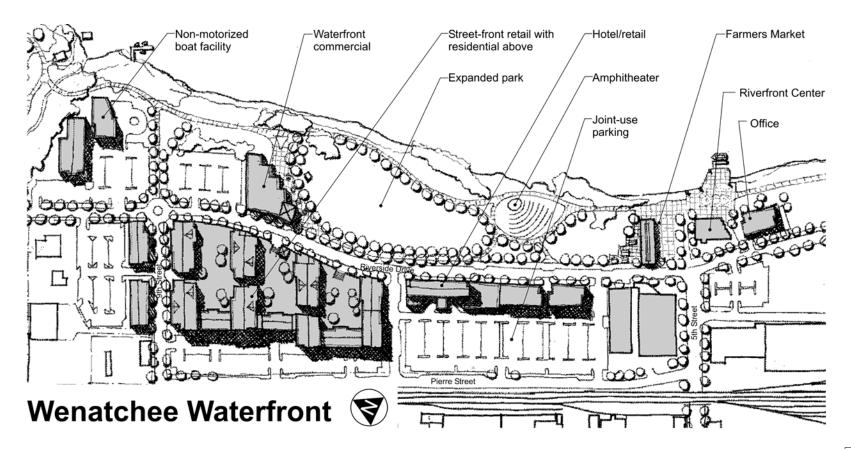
The Pedestrian Overlay designation requires retail uses on the ground floor with residential, office, and/or lodging uses encouraged on upper floors.
